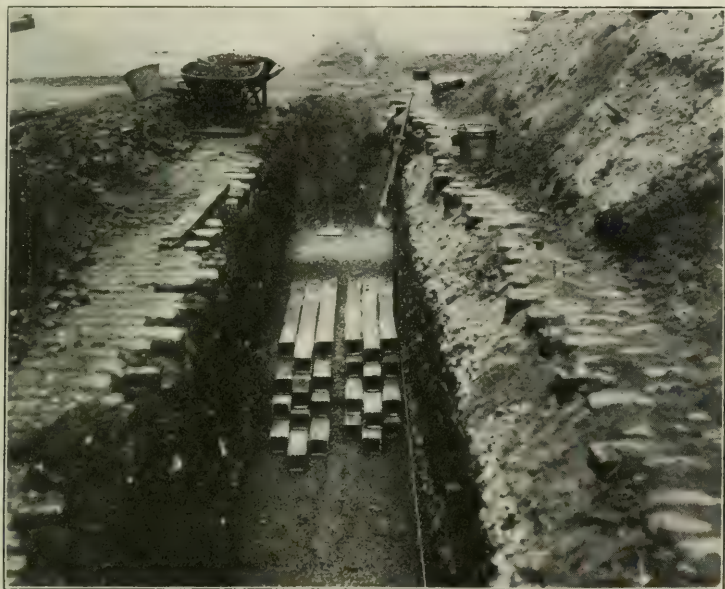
Duplex Line of 24 Ducts with a Vertical Concrete Barrier in the Center.
